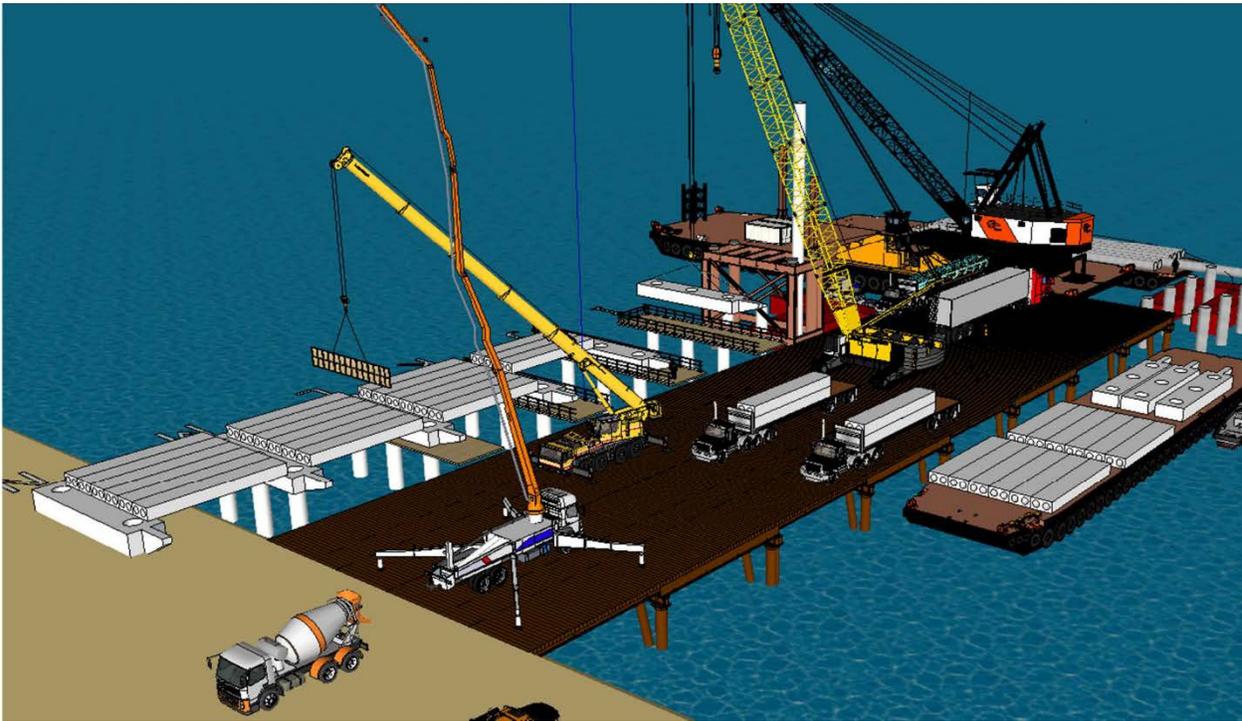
Stylized Illustration of a Typical Temporary Construction Work Trestle
